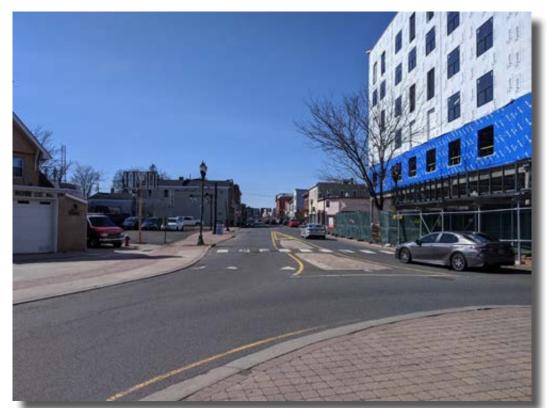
View looking west along Main Street. Note the building under construction on the north side of the Street (right) which replaced the former NRHP-eligible Bound Brook Hotel and Tavern (demolished).
